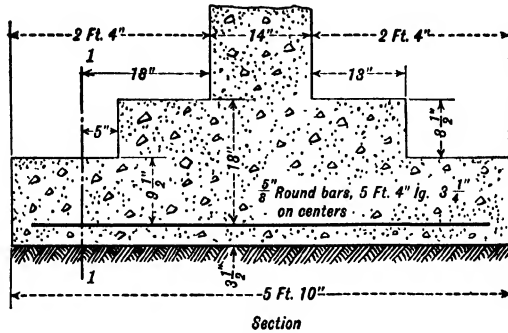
Stepped Wall Footing. (See p. 484.)
